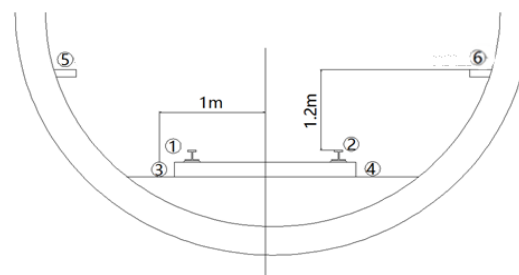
shows the arrangement of underground test measuring points, and the test collects vertical acceleration signal of the rail (measuring point 1-2), the track bed (measuring point 3-4) and tunnel wall (measuring point 5-6) of section I - III.
